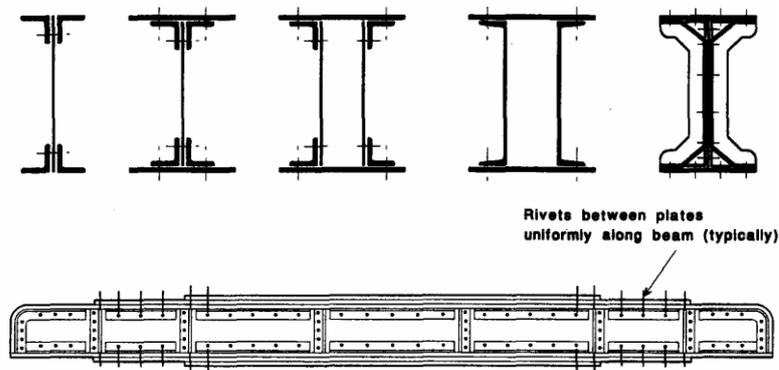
Typical cross-sections and elevation of wrought iron (Figures 3.7 and 3.8 in Bussell (1975))
